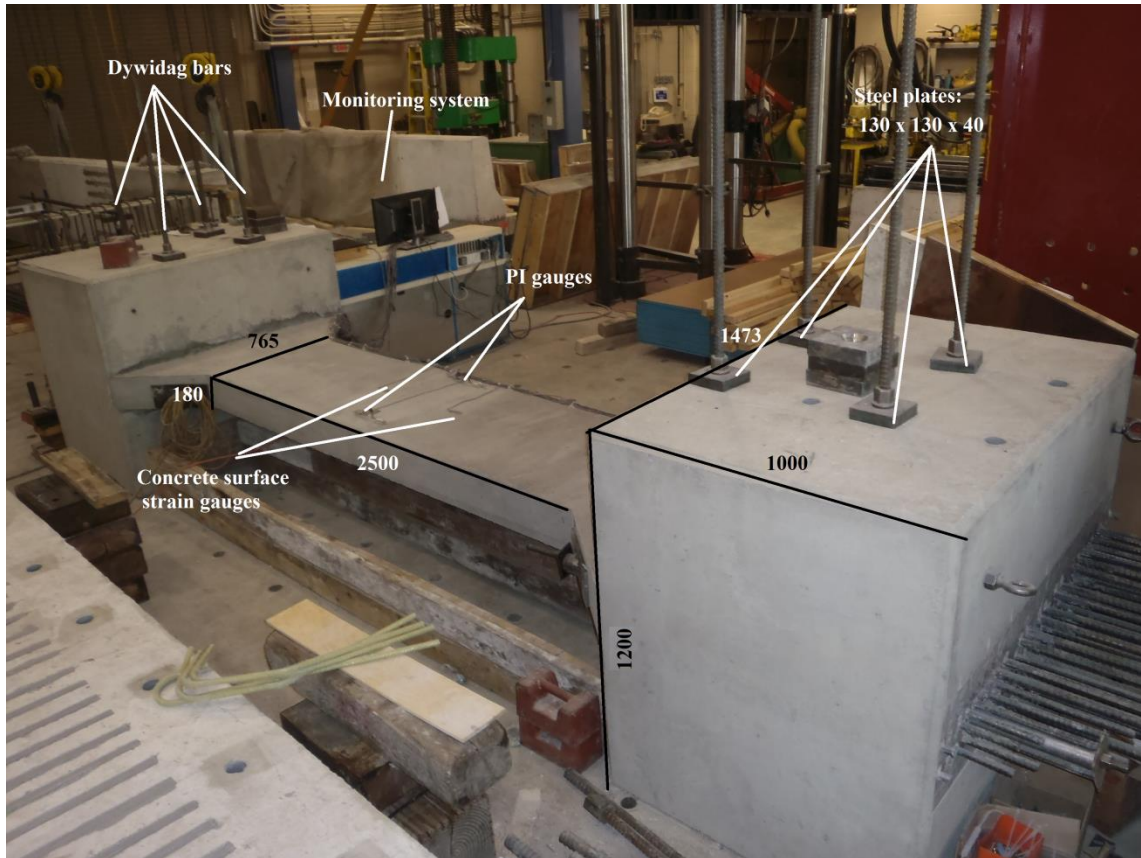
General view of the test setup and specimen under normal laboratory conditions (all dimensions are in mm).
